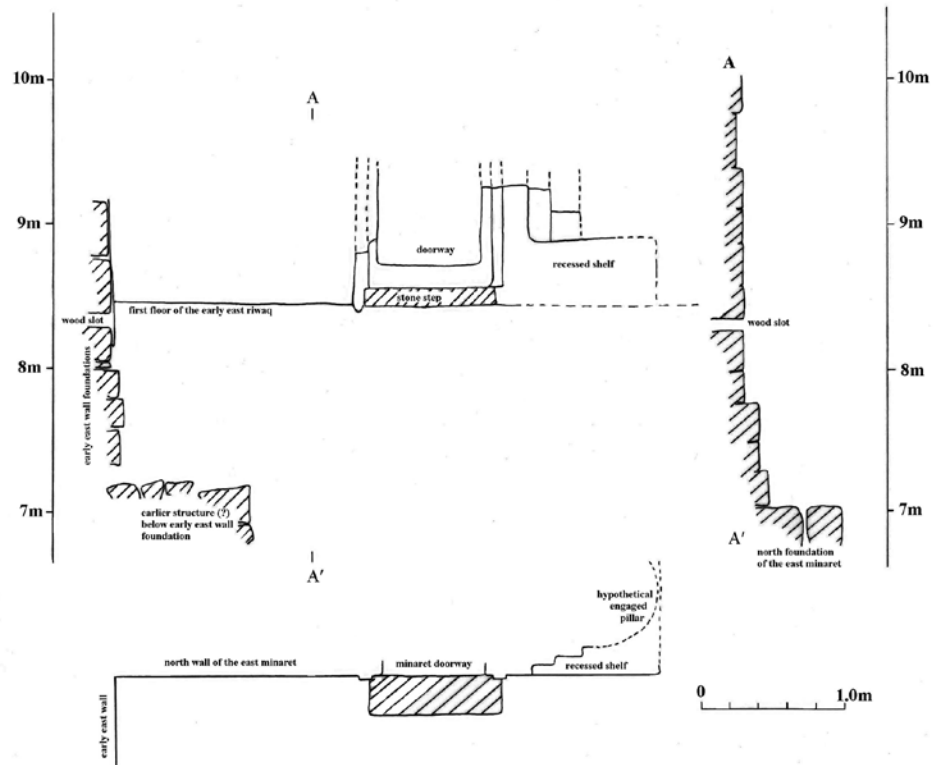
East minaret - north face of the original structure elevation and plan, with details of the wood slot and foundation coursing in profile (A-A'), with the adjacent early east wall foundation in profile.
